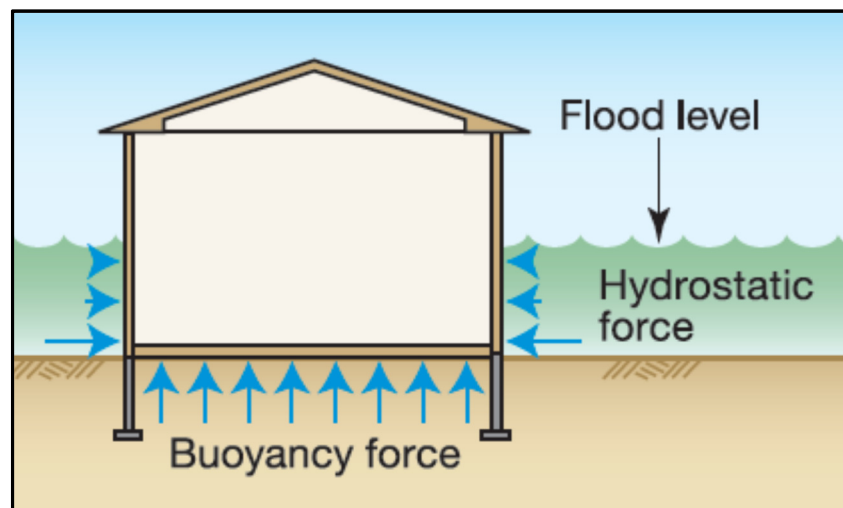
Hydrostatic Flood Load (source: FEMA P259 Engineering Principles and Practices)
